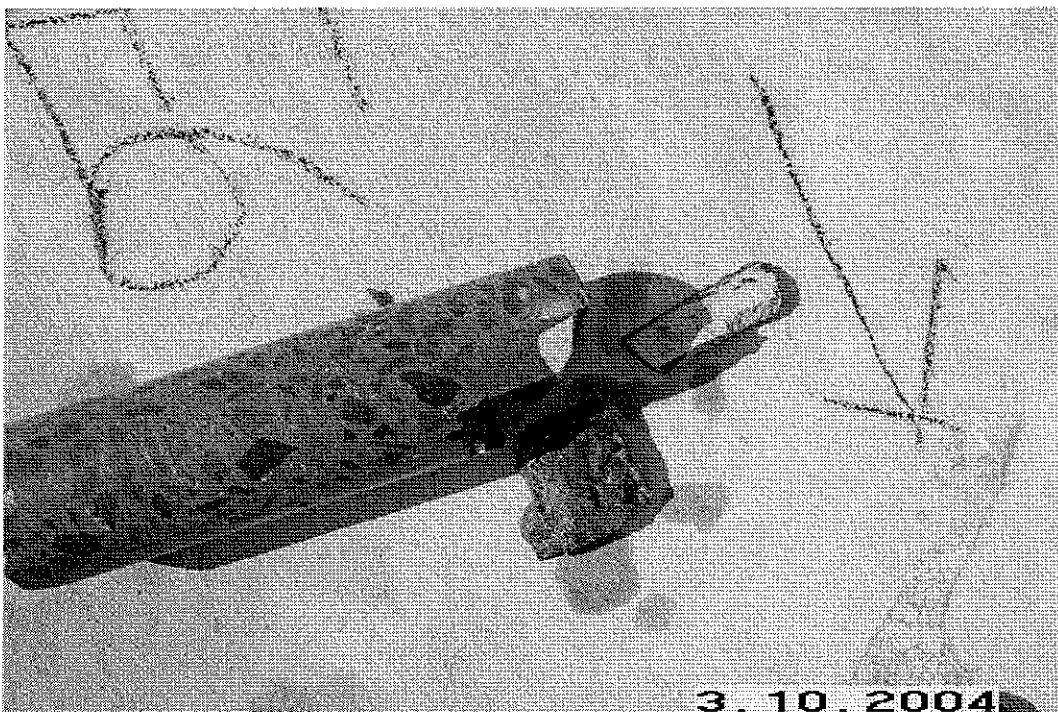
Core E6. Kim Repair Material at Crack at Top of Slab. Arrow indicates East.
